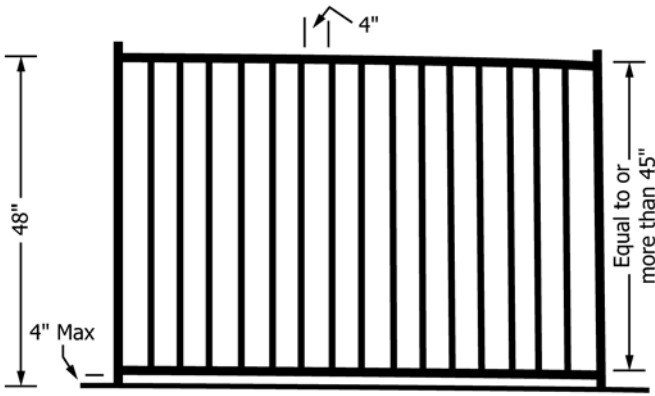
If Horizontal Members are Equal to or More Than 45 in. Apart, Vertical Spacing Shall Not Exceed 4 in.
